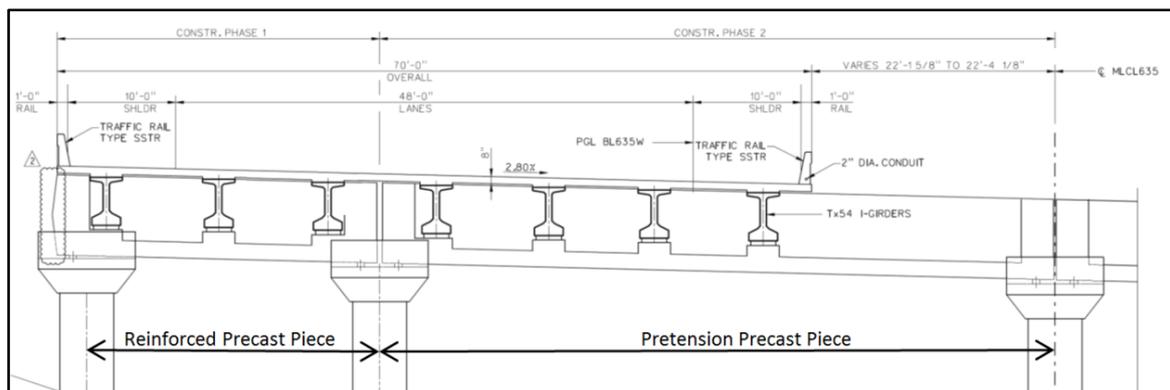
Precast caps with only reinforced vs precast and pre-stressed
